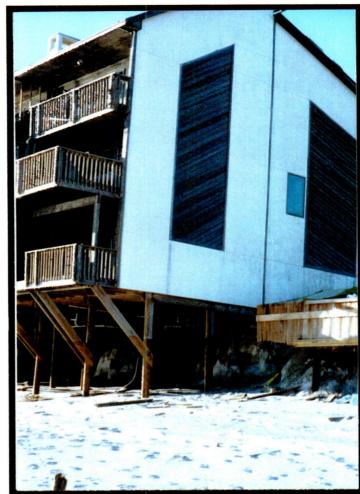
LOCATION MIRAMAR BCH, FL ON GULF OF MEXICO @ 1600 BLOCK, ALT. U.S. 98
